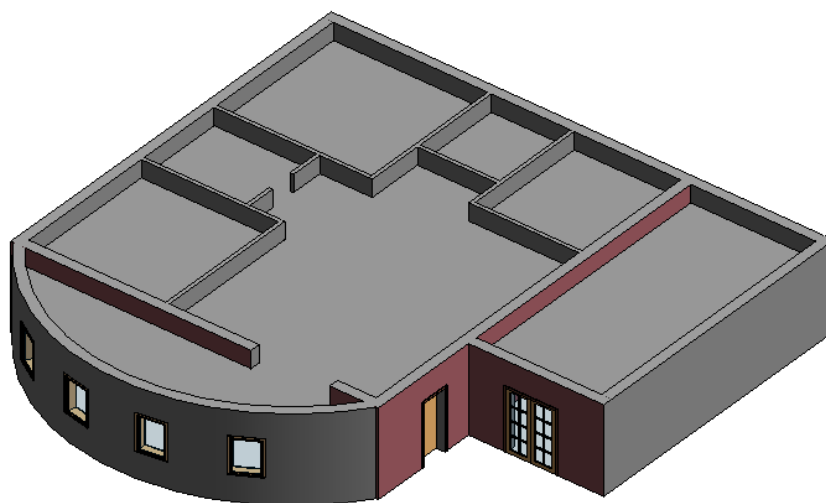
Three dimensional view of residential building with added floors and ceilings
